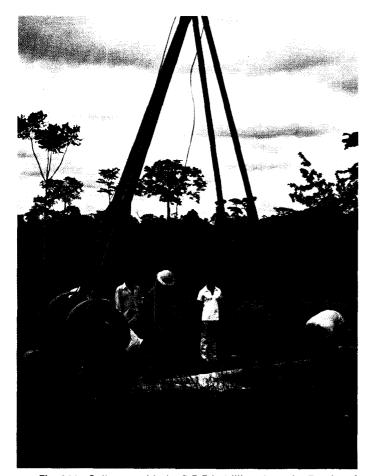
Soil tests with the B.R.R.I. drilling rig at the Faculty of Engineering, School of Mining Engineering site, U.S.T., 1982.
